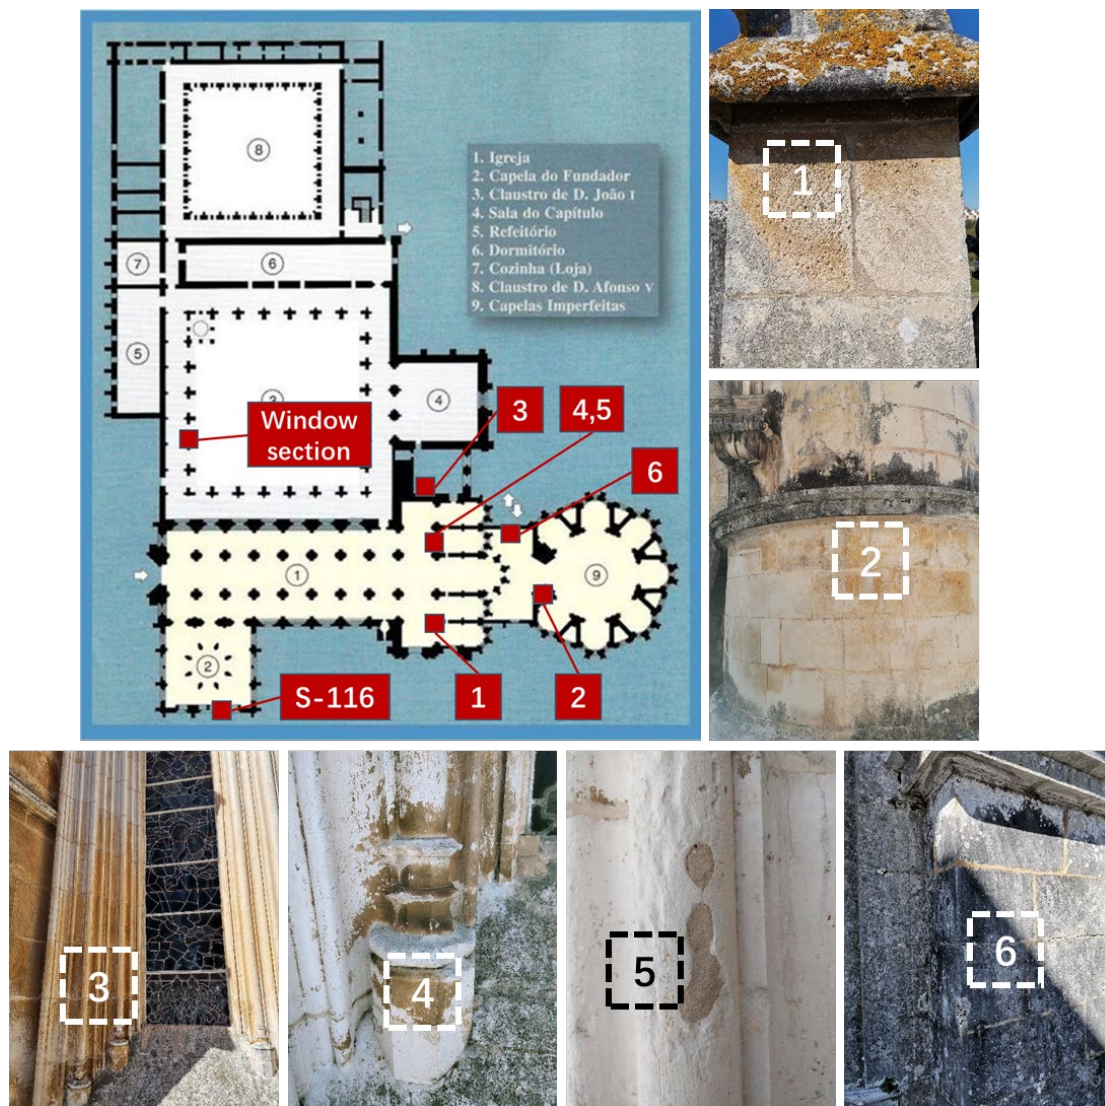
Locations in Batalha Monastery where samples were collected: 1). external wall on the roof, top floor; 2). big column on the imperfect chapel, second floor; 3). window frame of the church (bright saturated orange), second floor; 4). window frame from the church (dark brown orange) second floor; 5). window frame from the church (white), second floor; 6). archway on the imperfect chapel covered by black crust, second floor.
